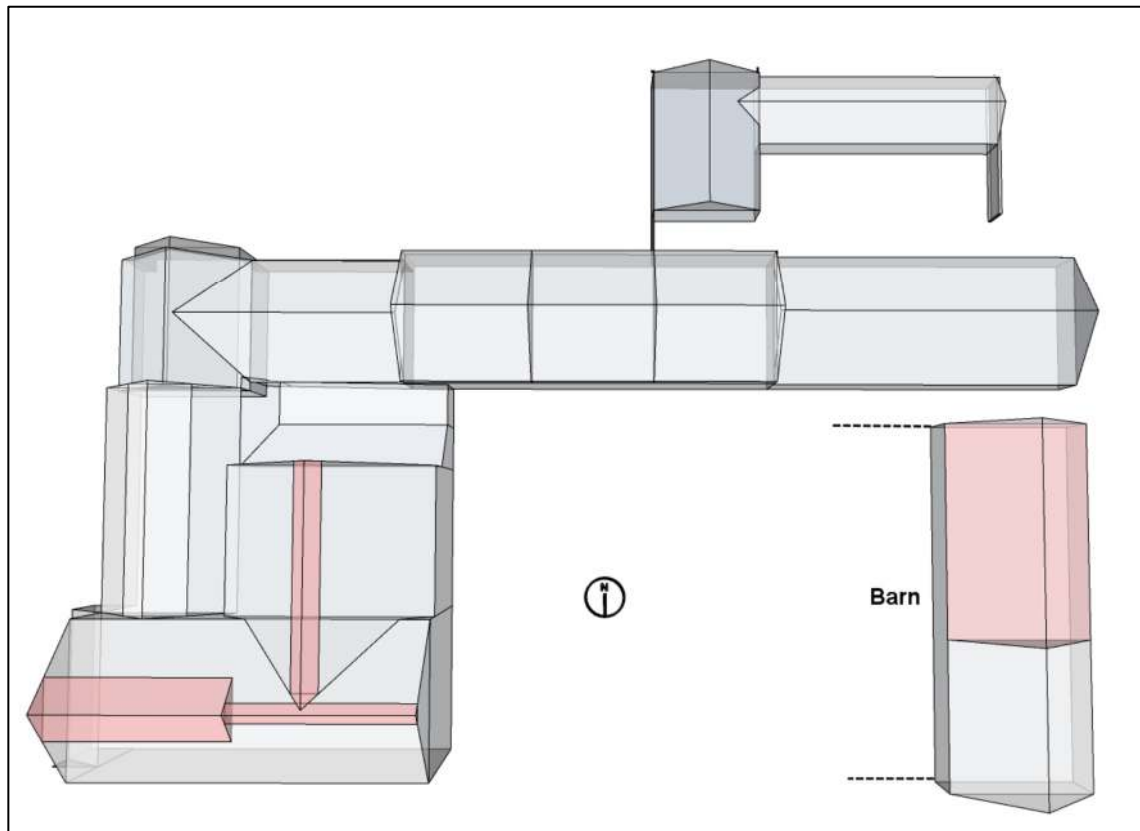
Rough plan of the house and outbuildings showing the location of the surveyed Barn
